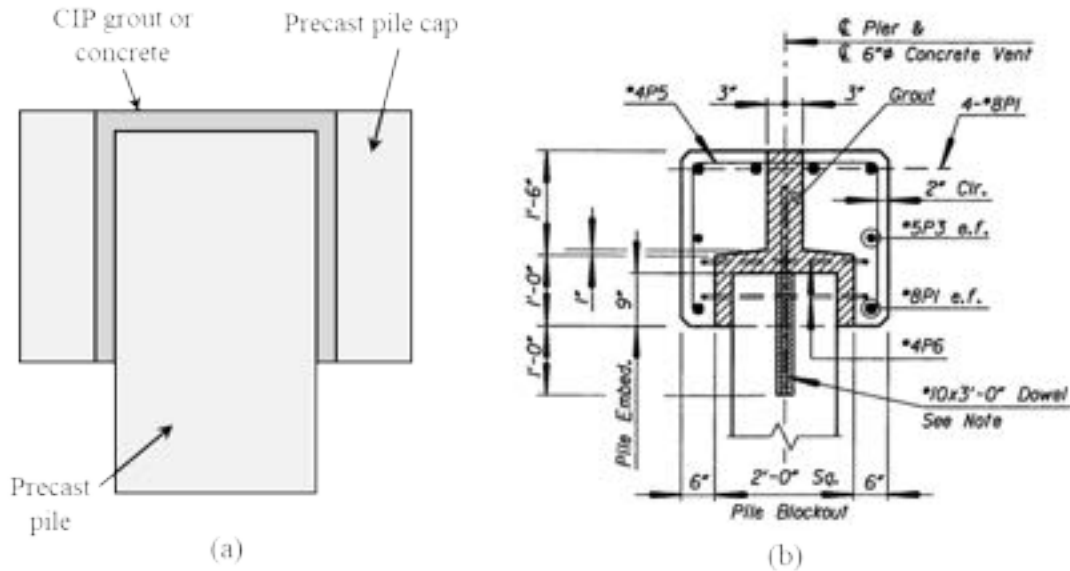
Examples of Socket Connections between Pile cap and pile: (a) connection between two precast elements; (b) connection used in Parker River Bridge (2007)(Department of Transportation Federal Highway Administration, 2004).
